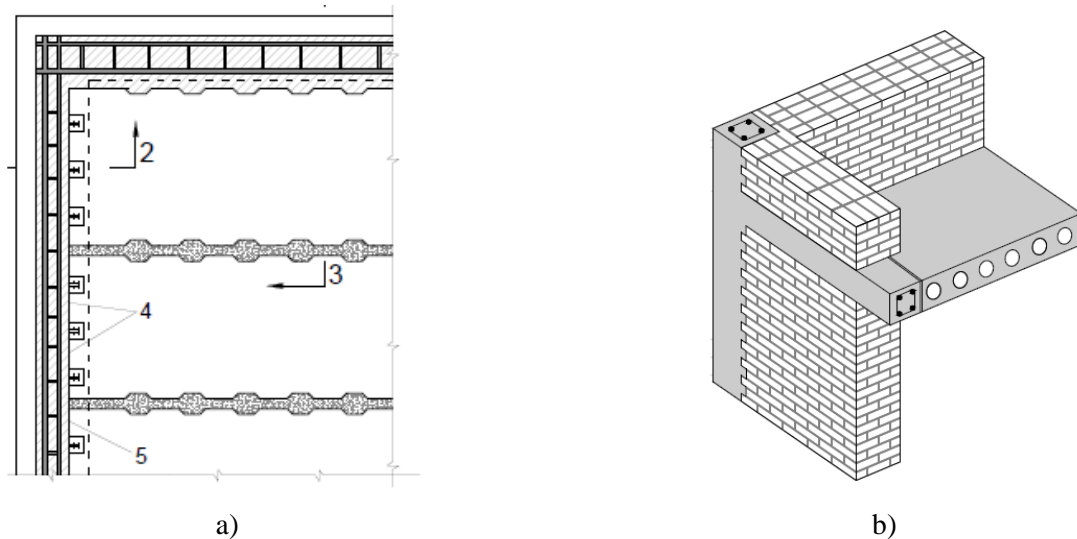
Features of masonry school buildings: a) precast RC floor slab showing hollow-core planks, and b) RC confining elements embedded in masonry walls [1]
